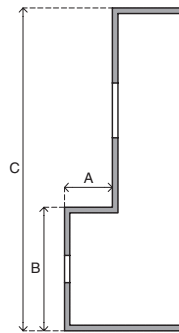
Articulated walls with major openings (where wall height exceeds 3.5m)
